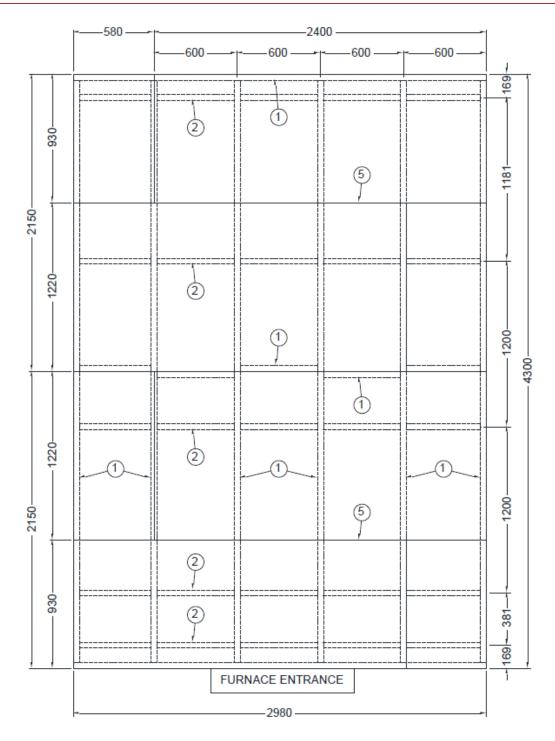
General Plan View of the Unexposed Face Showing Timber Framework
